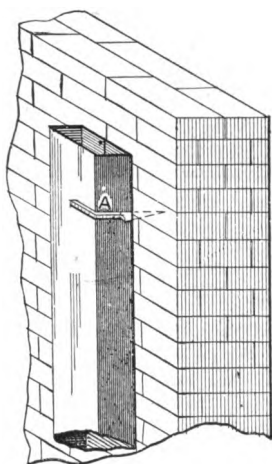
Square Pipe Fastened Against a Wall with Hook Shown in Fig. 88.
